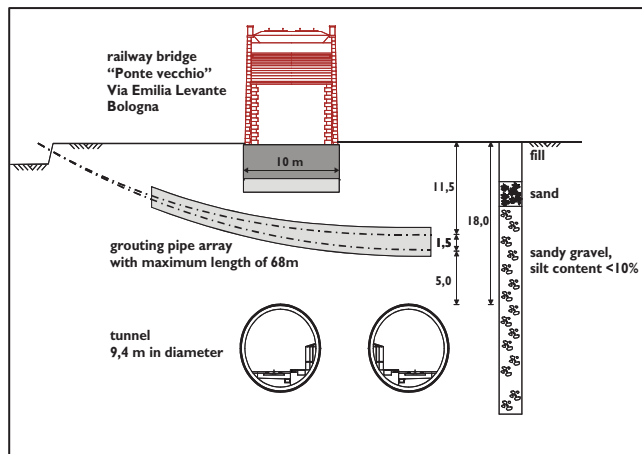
Sketch of the “compensation grouting system for underpassing the “Via emilia Bridge”.
